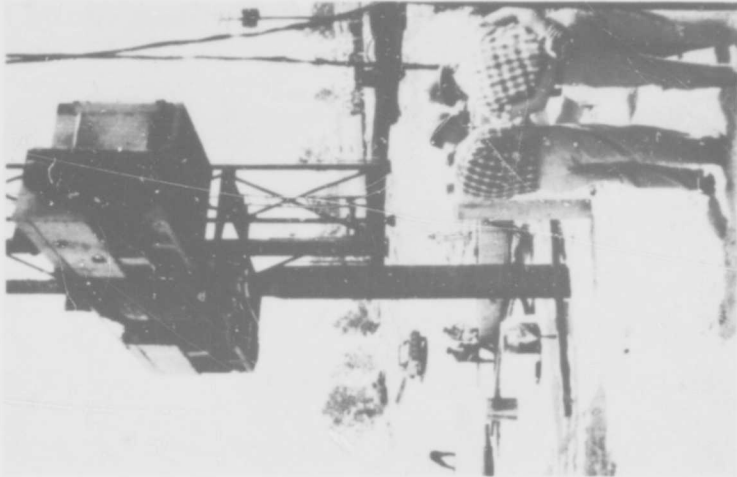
Driving Steel-H Pile with Bodine Sonic Hammer, Test Pile 9 - L4BP73
